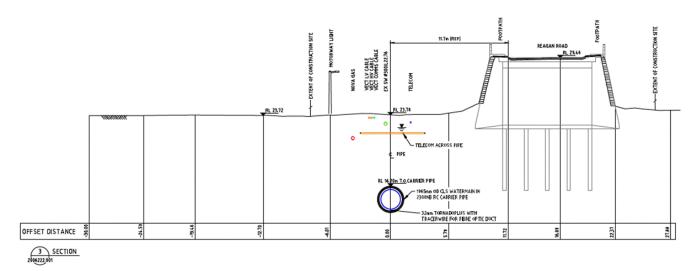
SH1 Crossing Services Section 2 – proximity to overbridge piles
